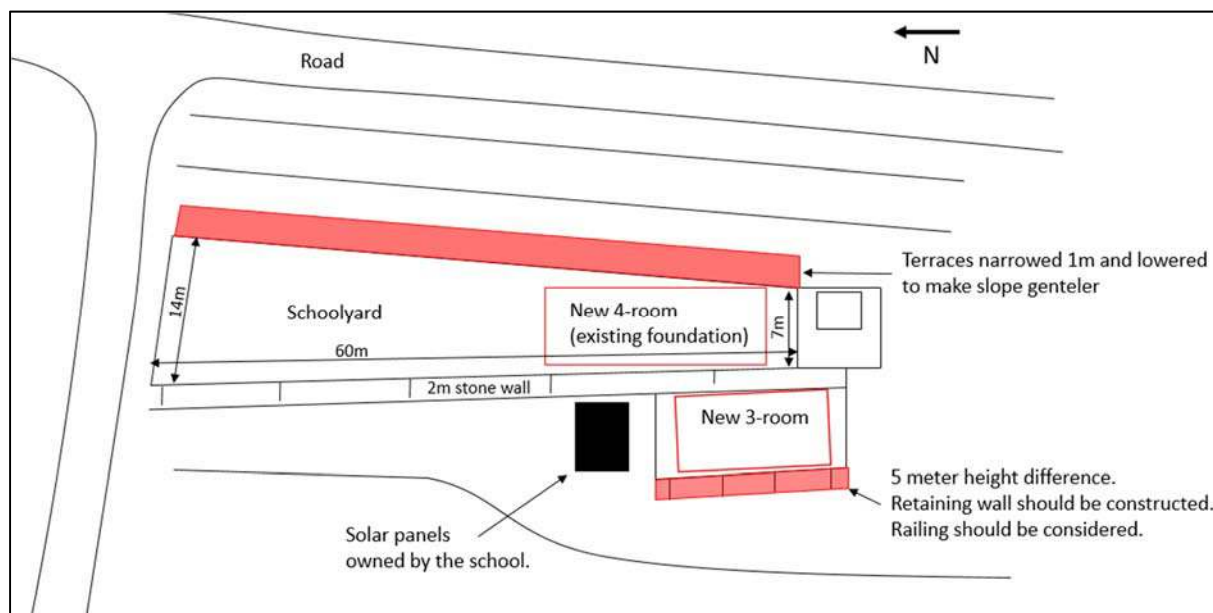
Plan view – Himkhande Bhuwaneswori. The slope west (below) of the plot should be secured by a retaining wall..
